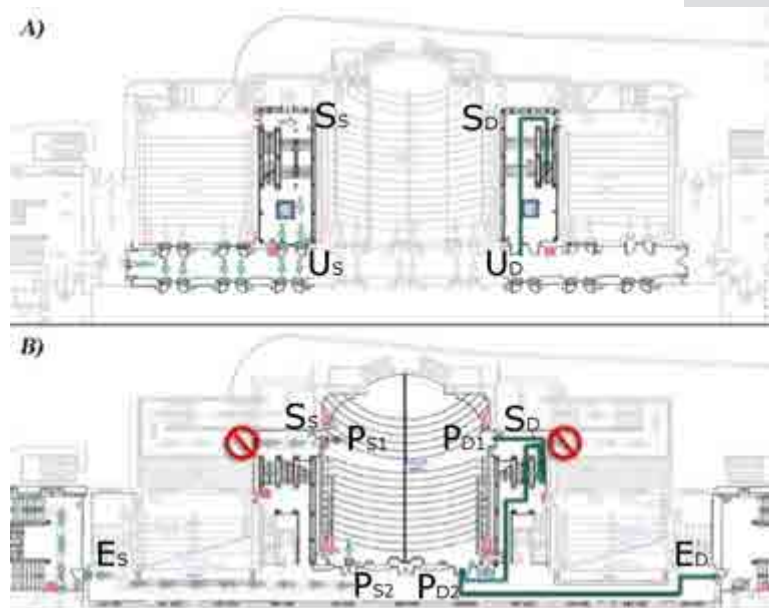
Layout of the application scenario for indoor fire evacuation: A) plan of the ground floor; B) plant of the first floor. The figure points out: the emergency exits (U_S and E_S ; U_D and E_D); the evacuation routes for each considered half of the building (arrows according to the emergency plan for the left half, which involved passive solutions; continuous line for the right half, which involved CBE); the staircases (S_S and S_D); exit doors from the classroom.
